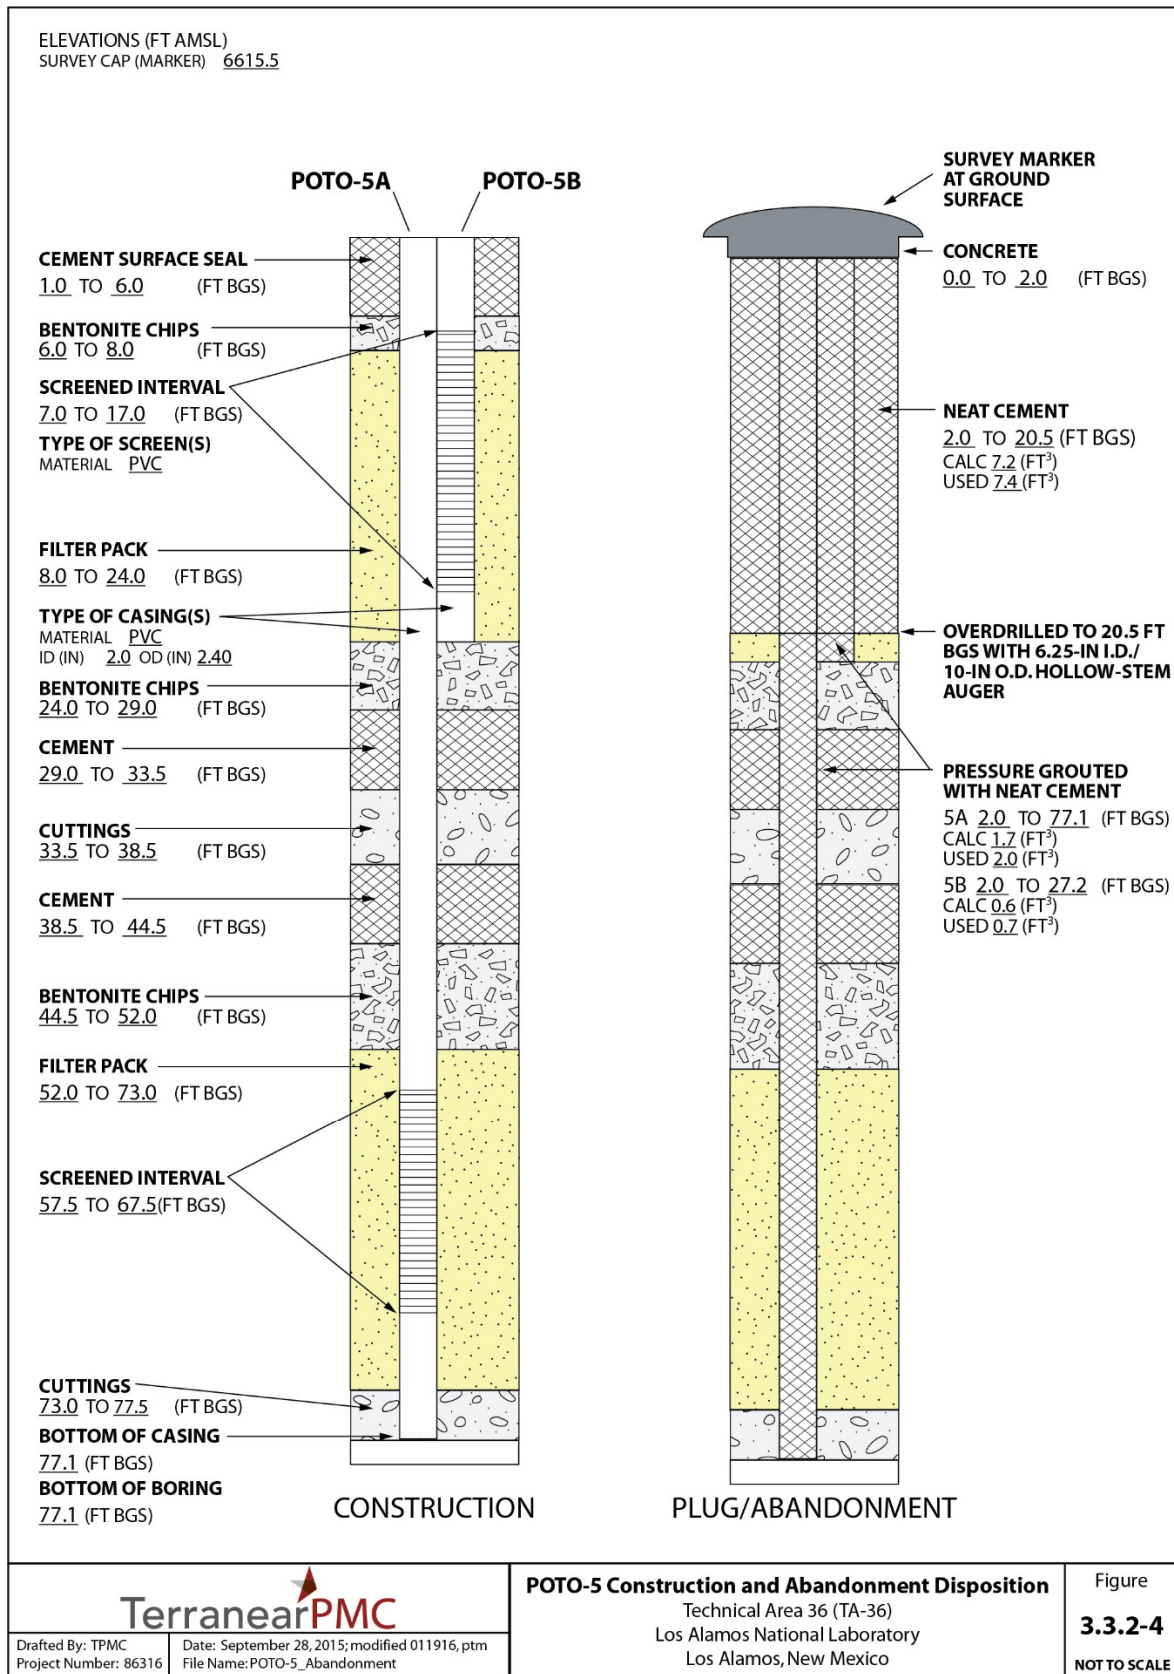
POTO-5A, B construction and abandonment disposition
